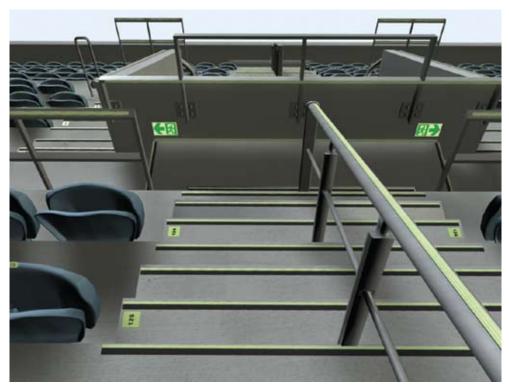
Showing step and handrail markings, aisle labelling and directional signage.
